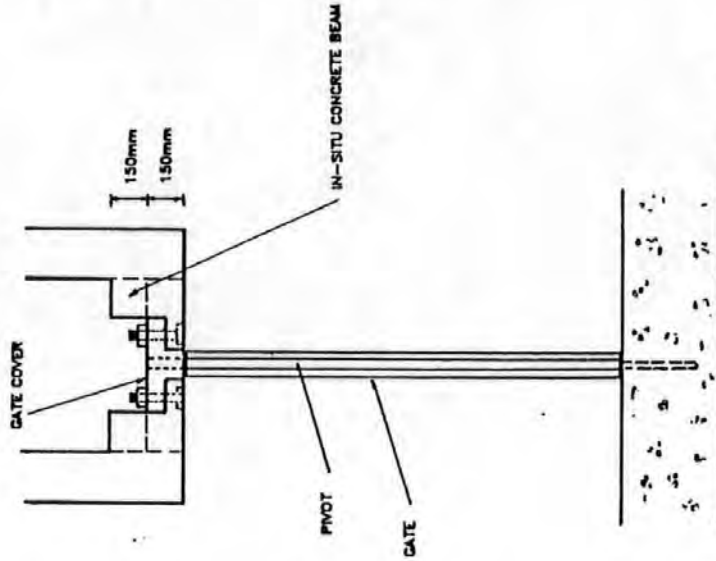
IN-SITU CONCRETE GATE COVER
